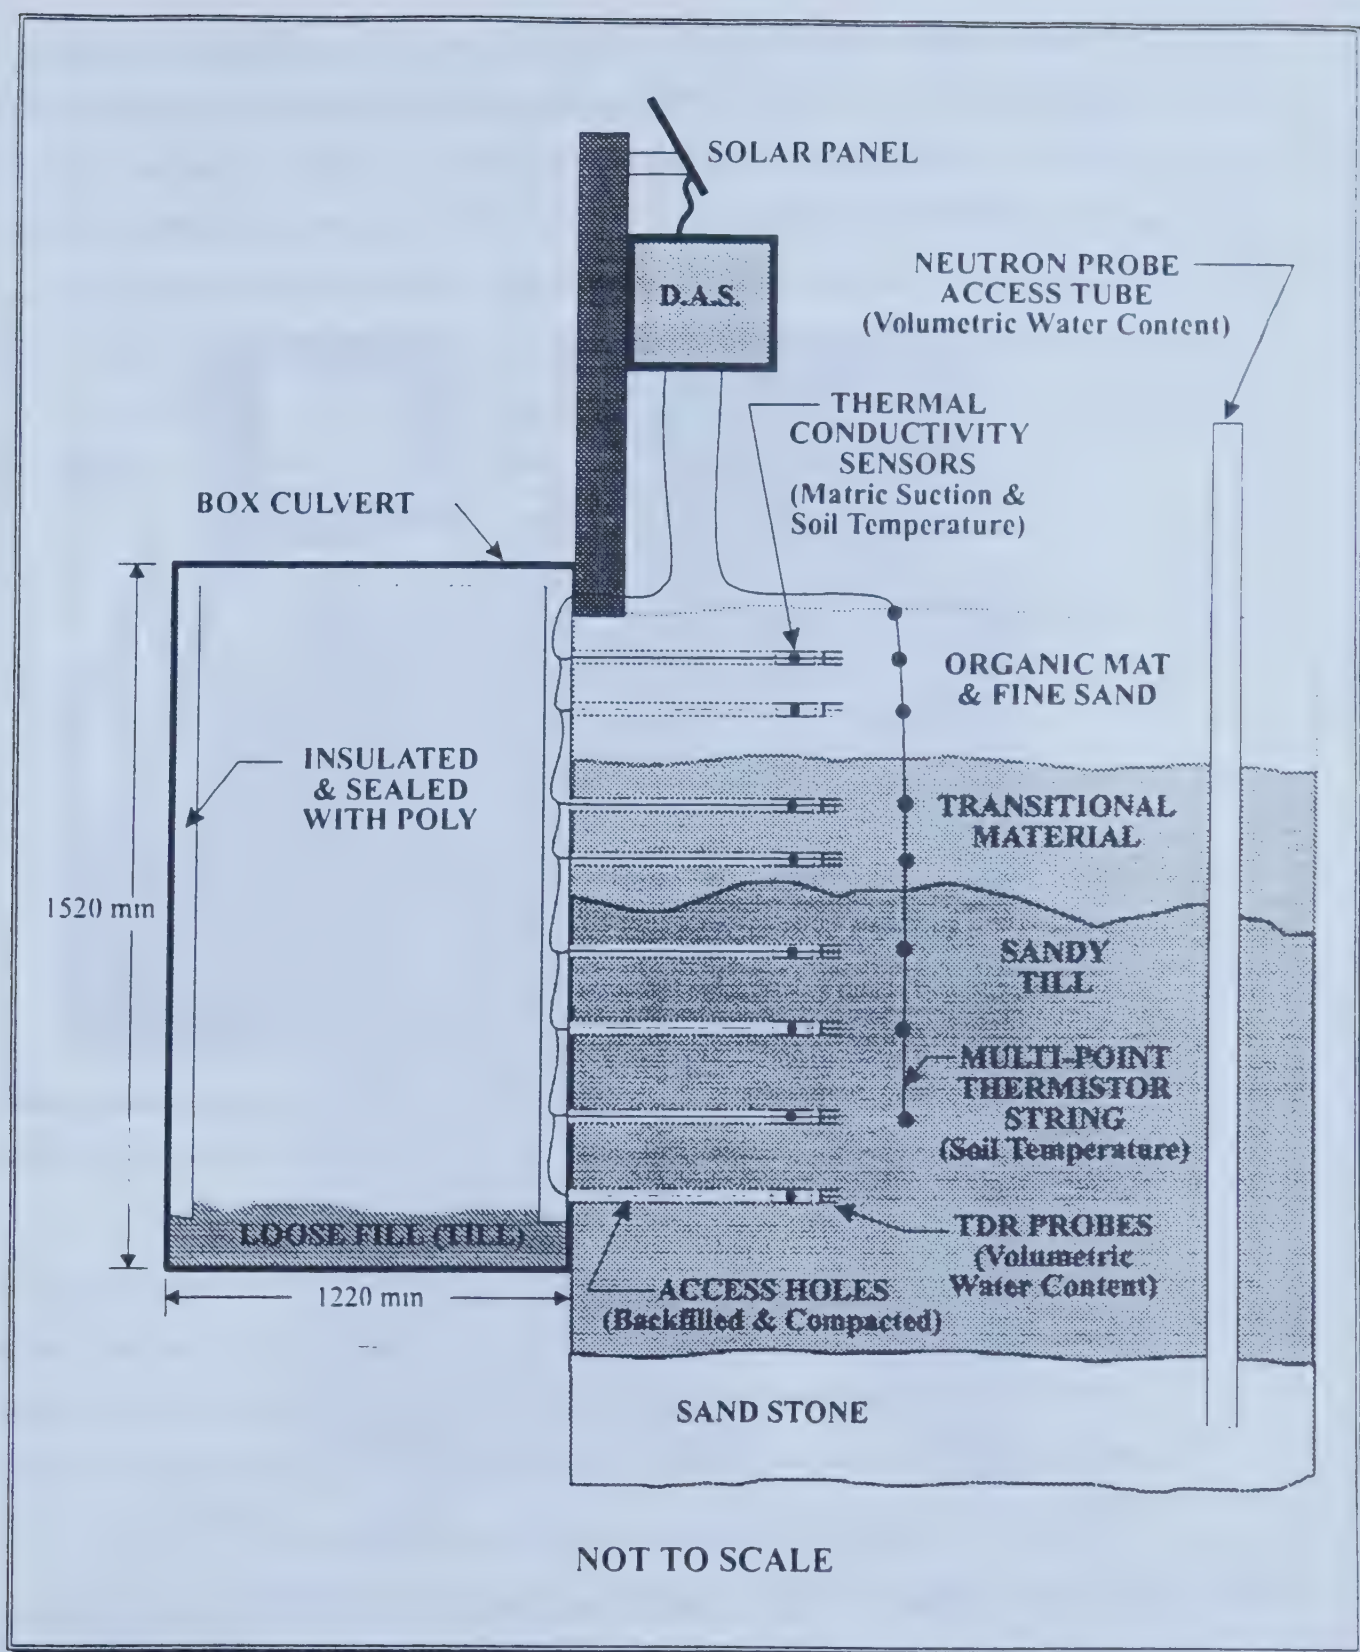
Cross-section of the access box culvert and sensor installations at the natural soils monitoring site (after Ayres, 1995).
